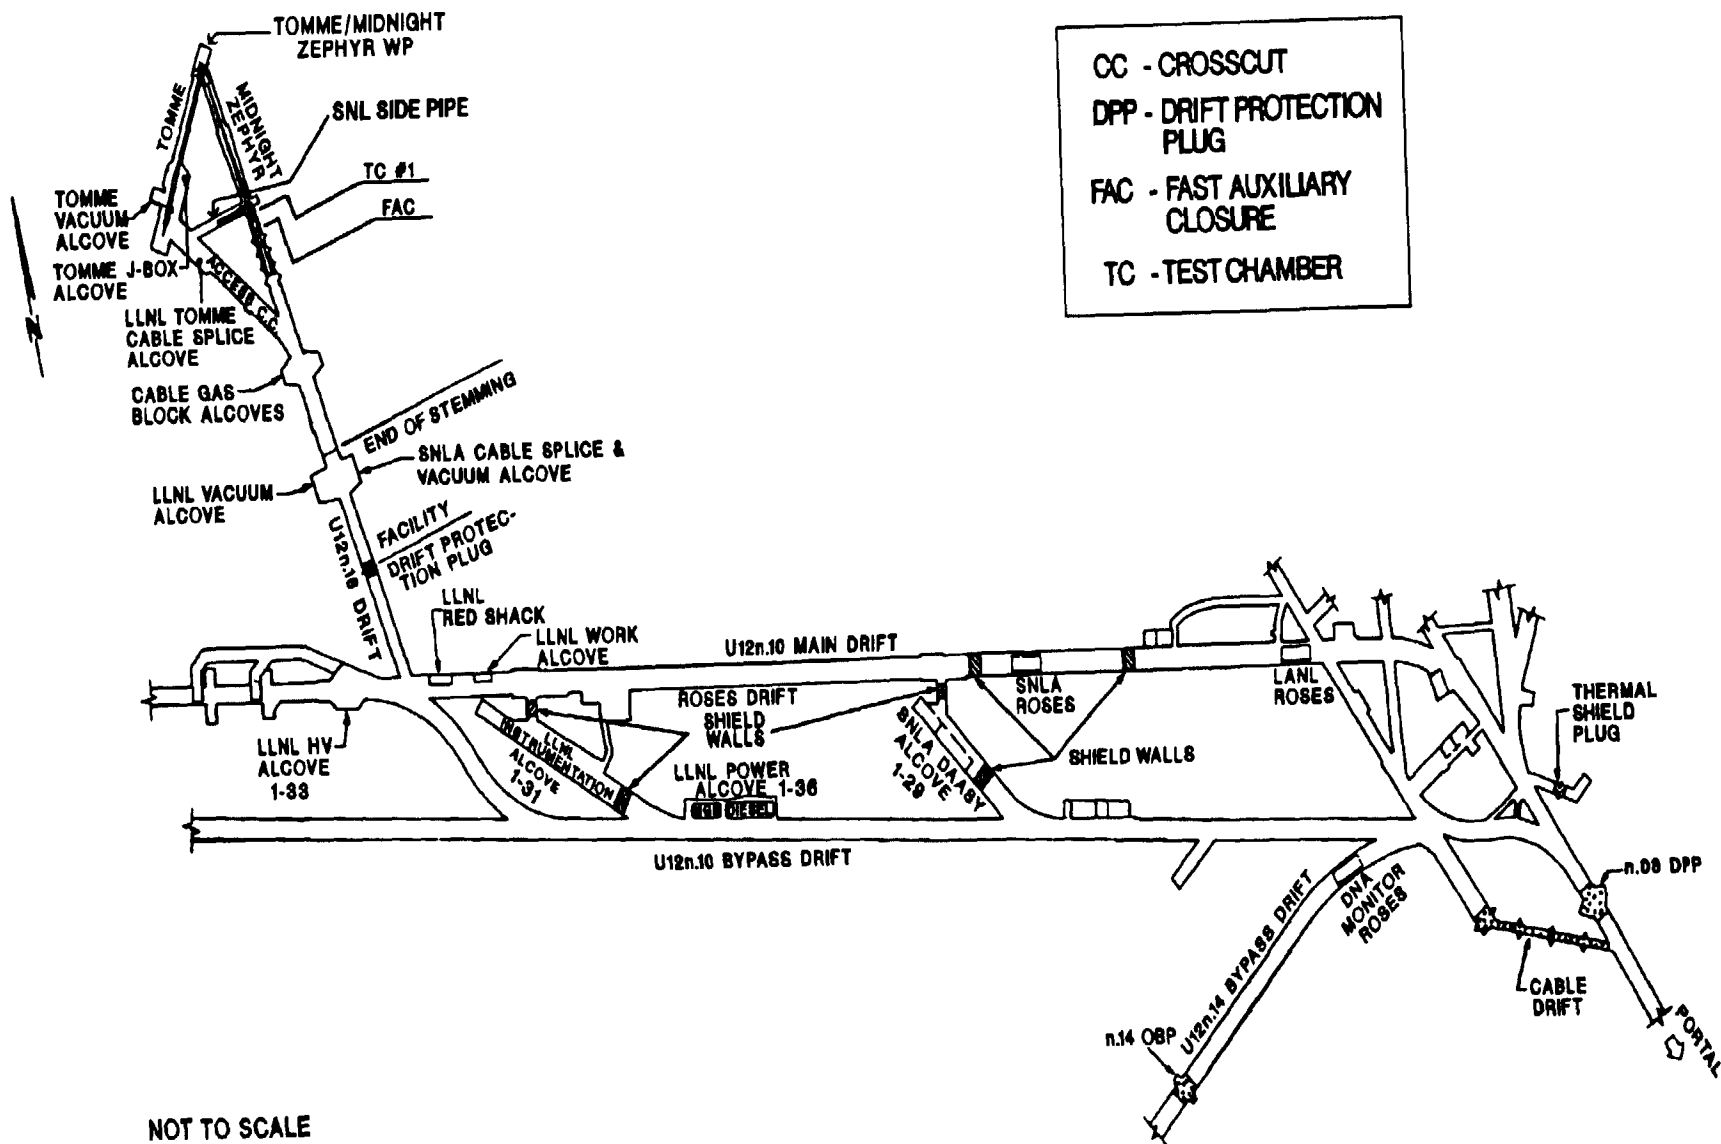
TOMME/MIDNIGHT ZEPHYR event - tunnel and pipe layout.
